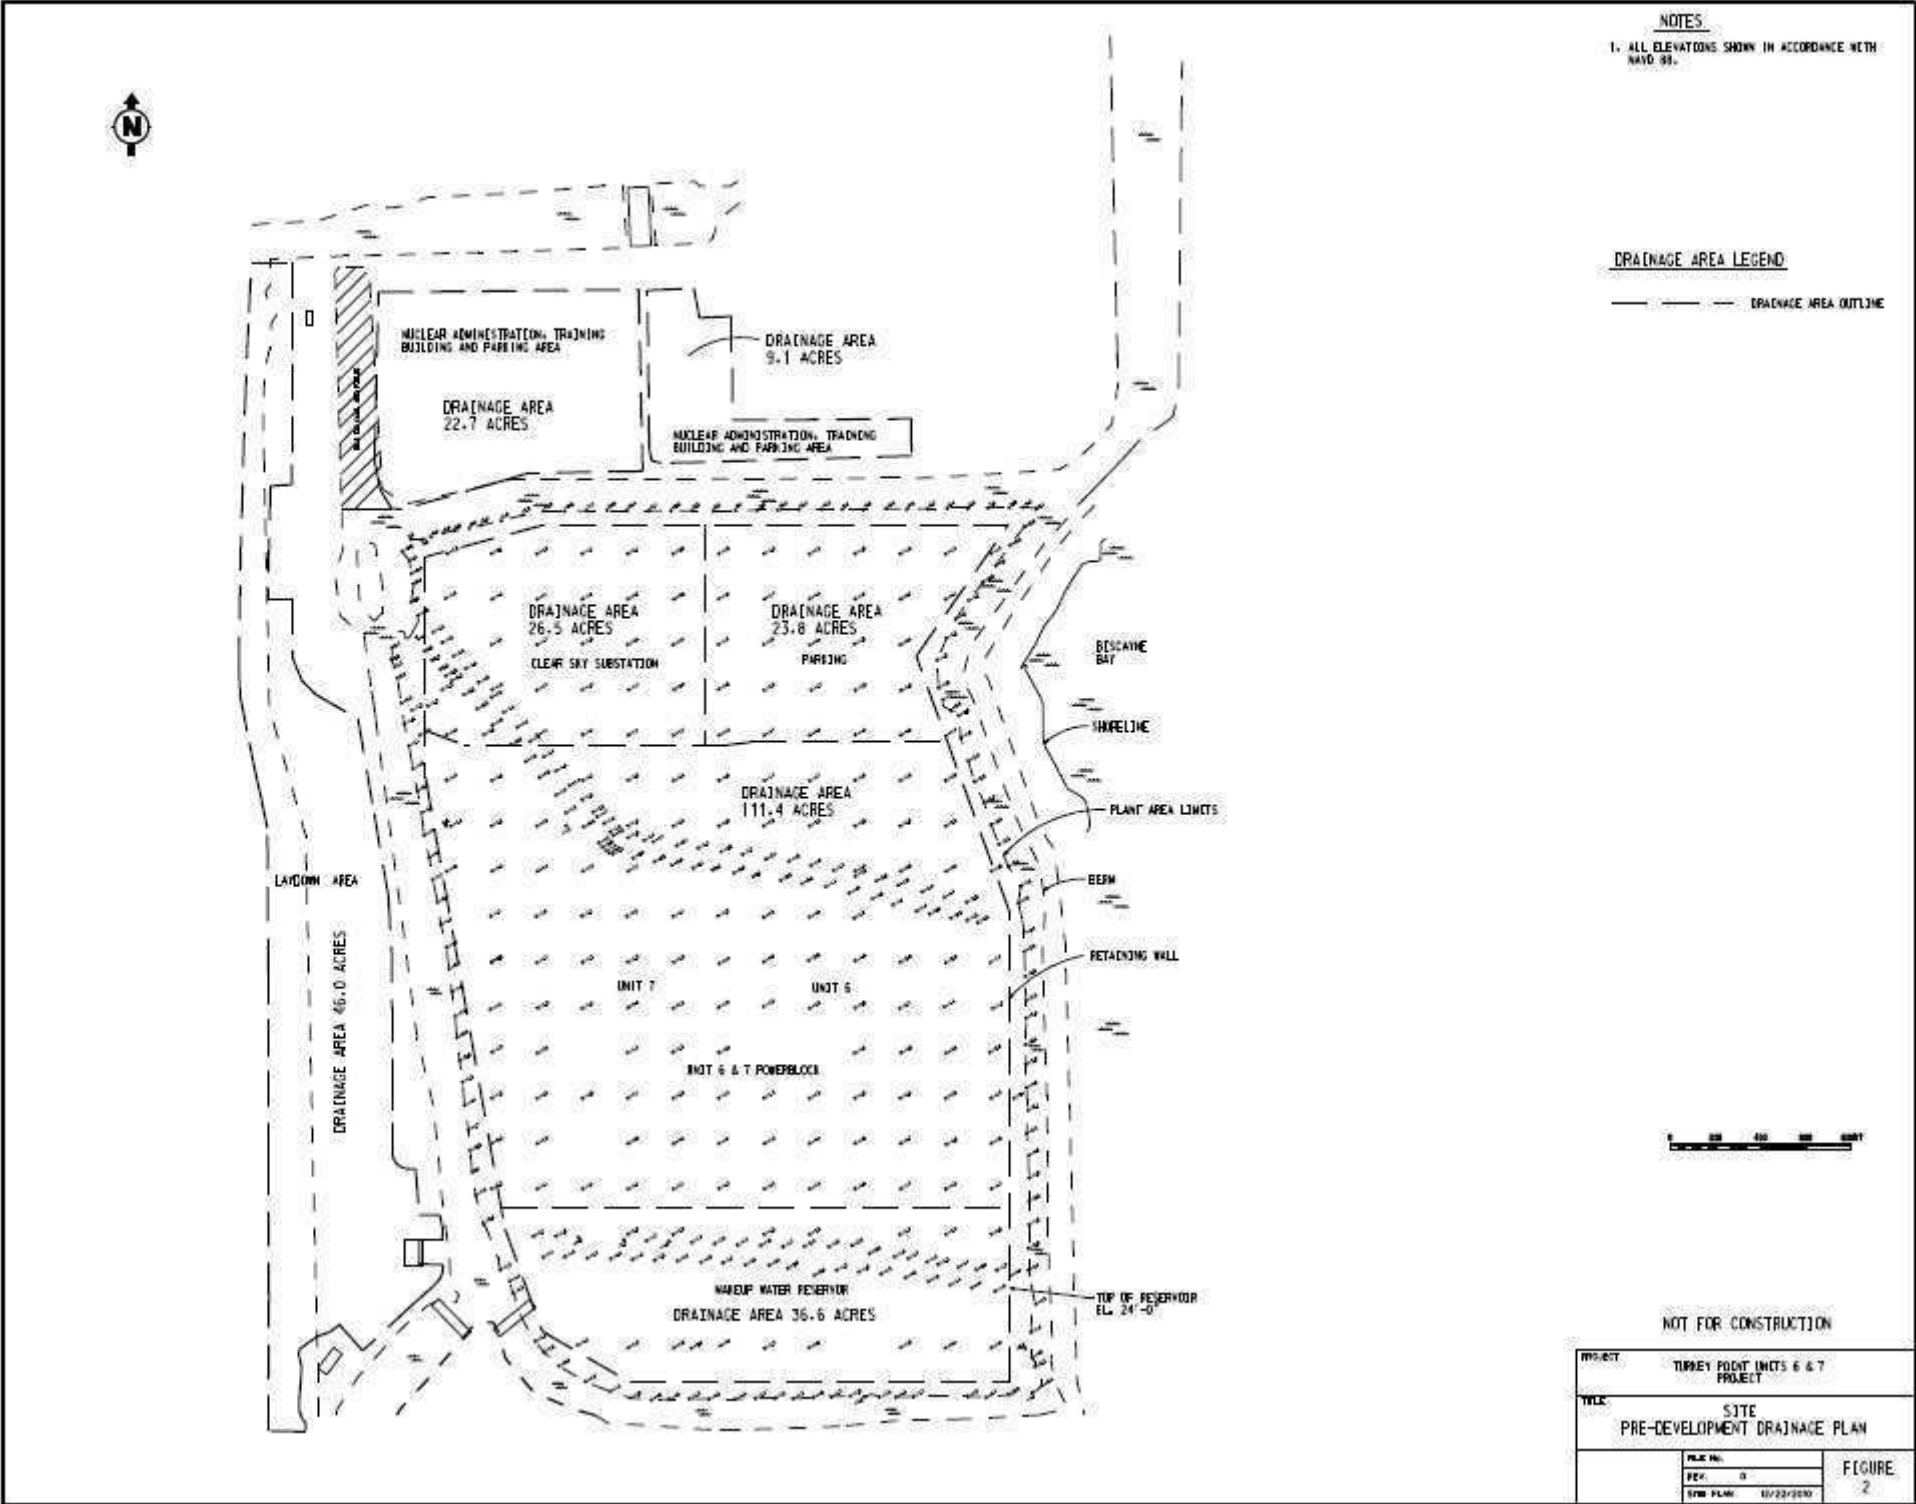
Turkey Point Unit 6 & 7 Site Existing Condition Drainage Plan
